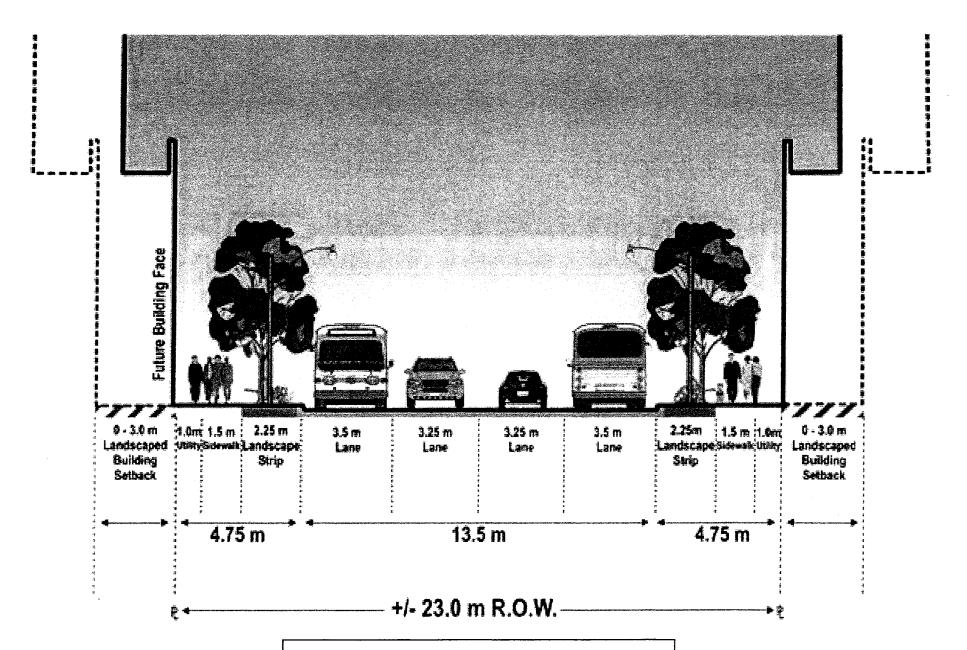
LOCAL ROAD AND STREETSCAPE (with transit)
